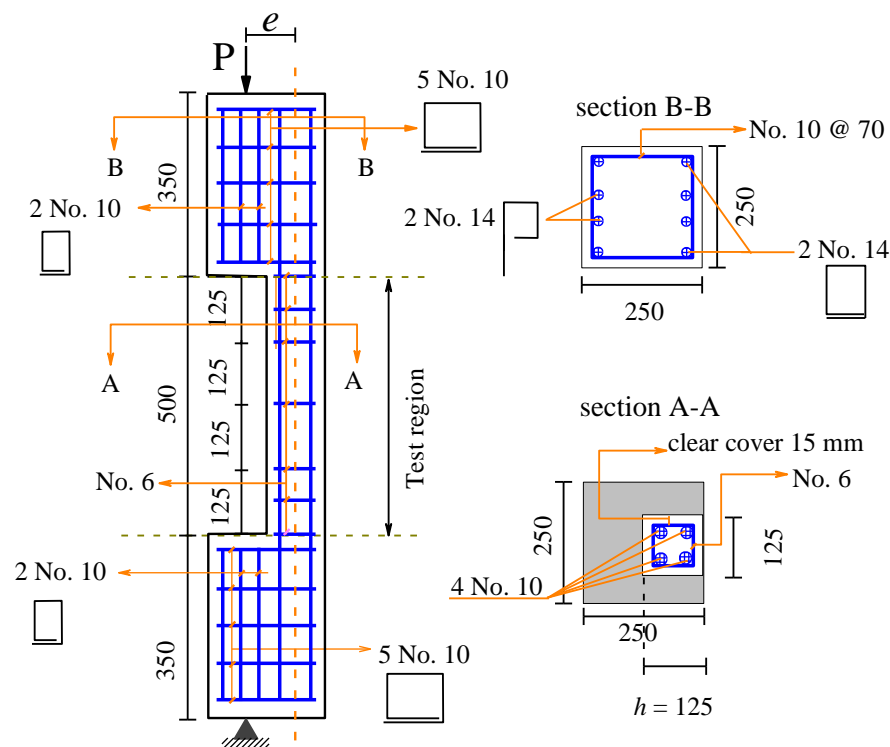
Details of the test specimen (El-Maaddawy, 2009) (dimensions in mm).
